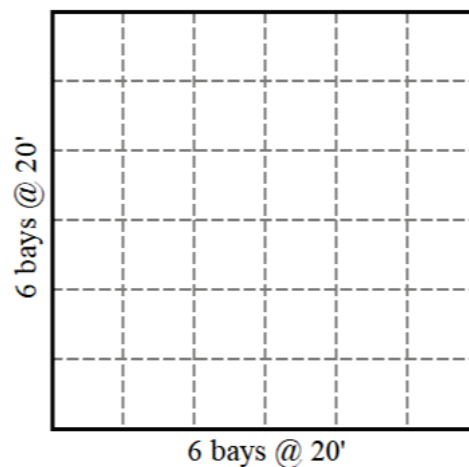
Baseline RC moment frame building typical 4-story plan.
